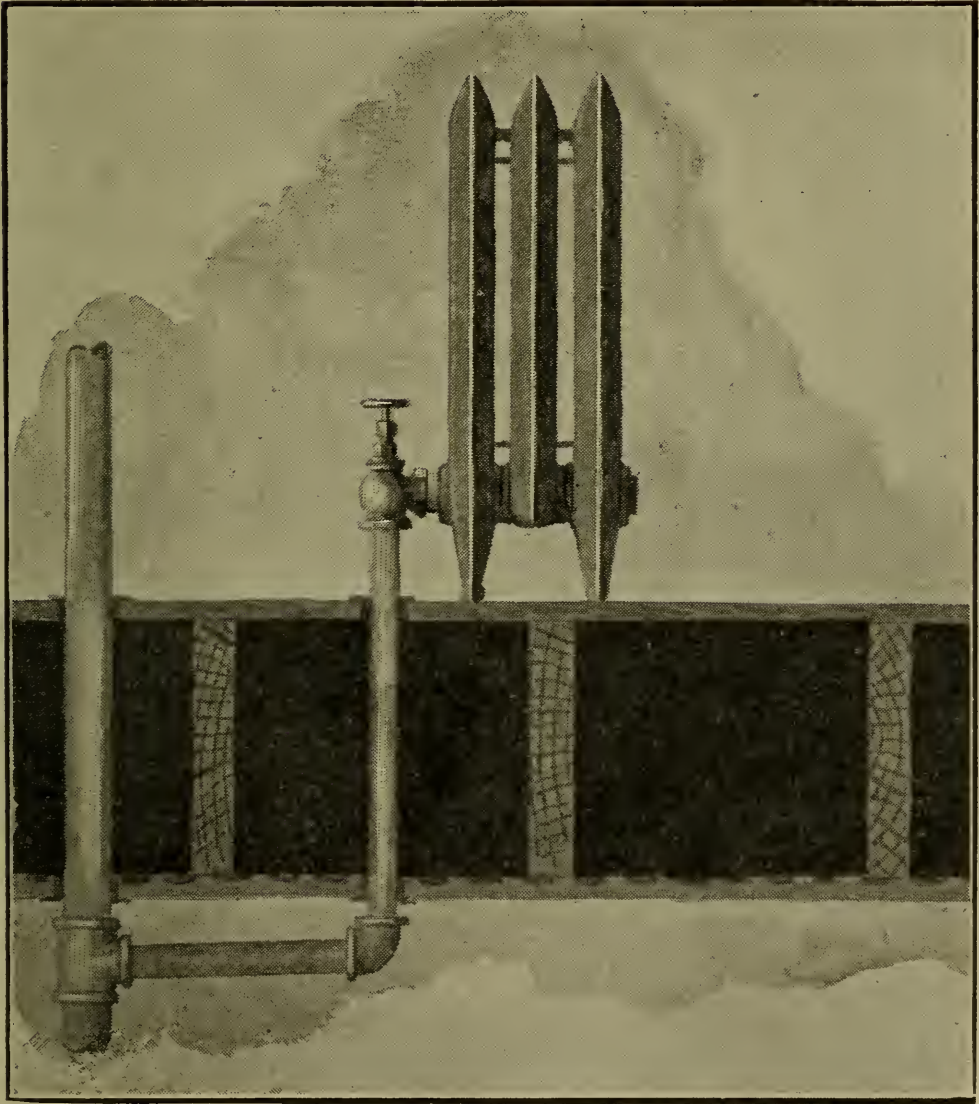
Sometimes used on upper floors: horizontal pipe exposed below ceilings is an objection. Will do for store and undecorated rooms.
